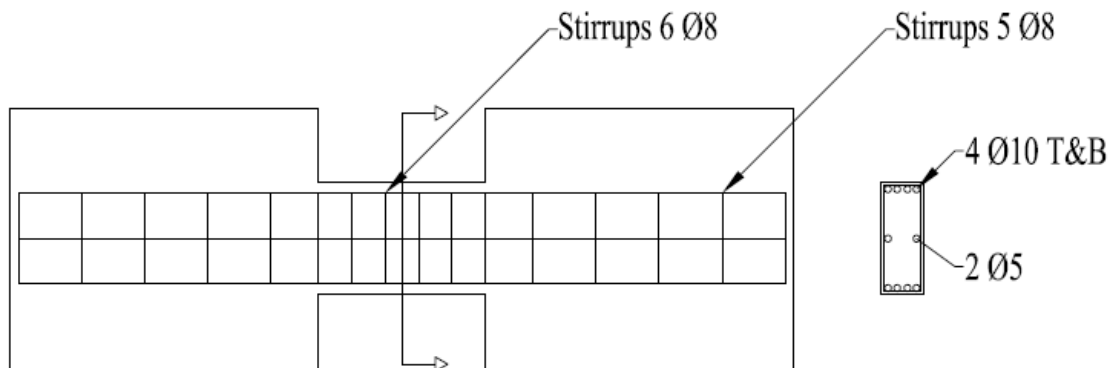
Reinforcement Details of Specimen P02 (Adapted from Galano and Vignoli 2000)
